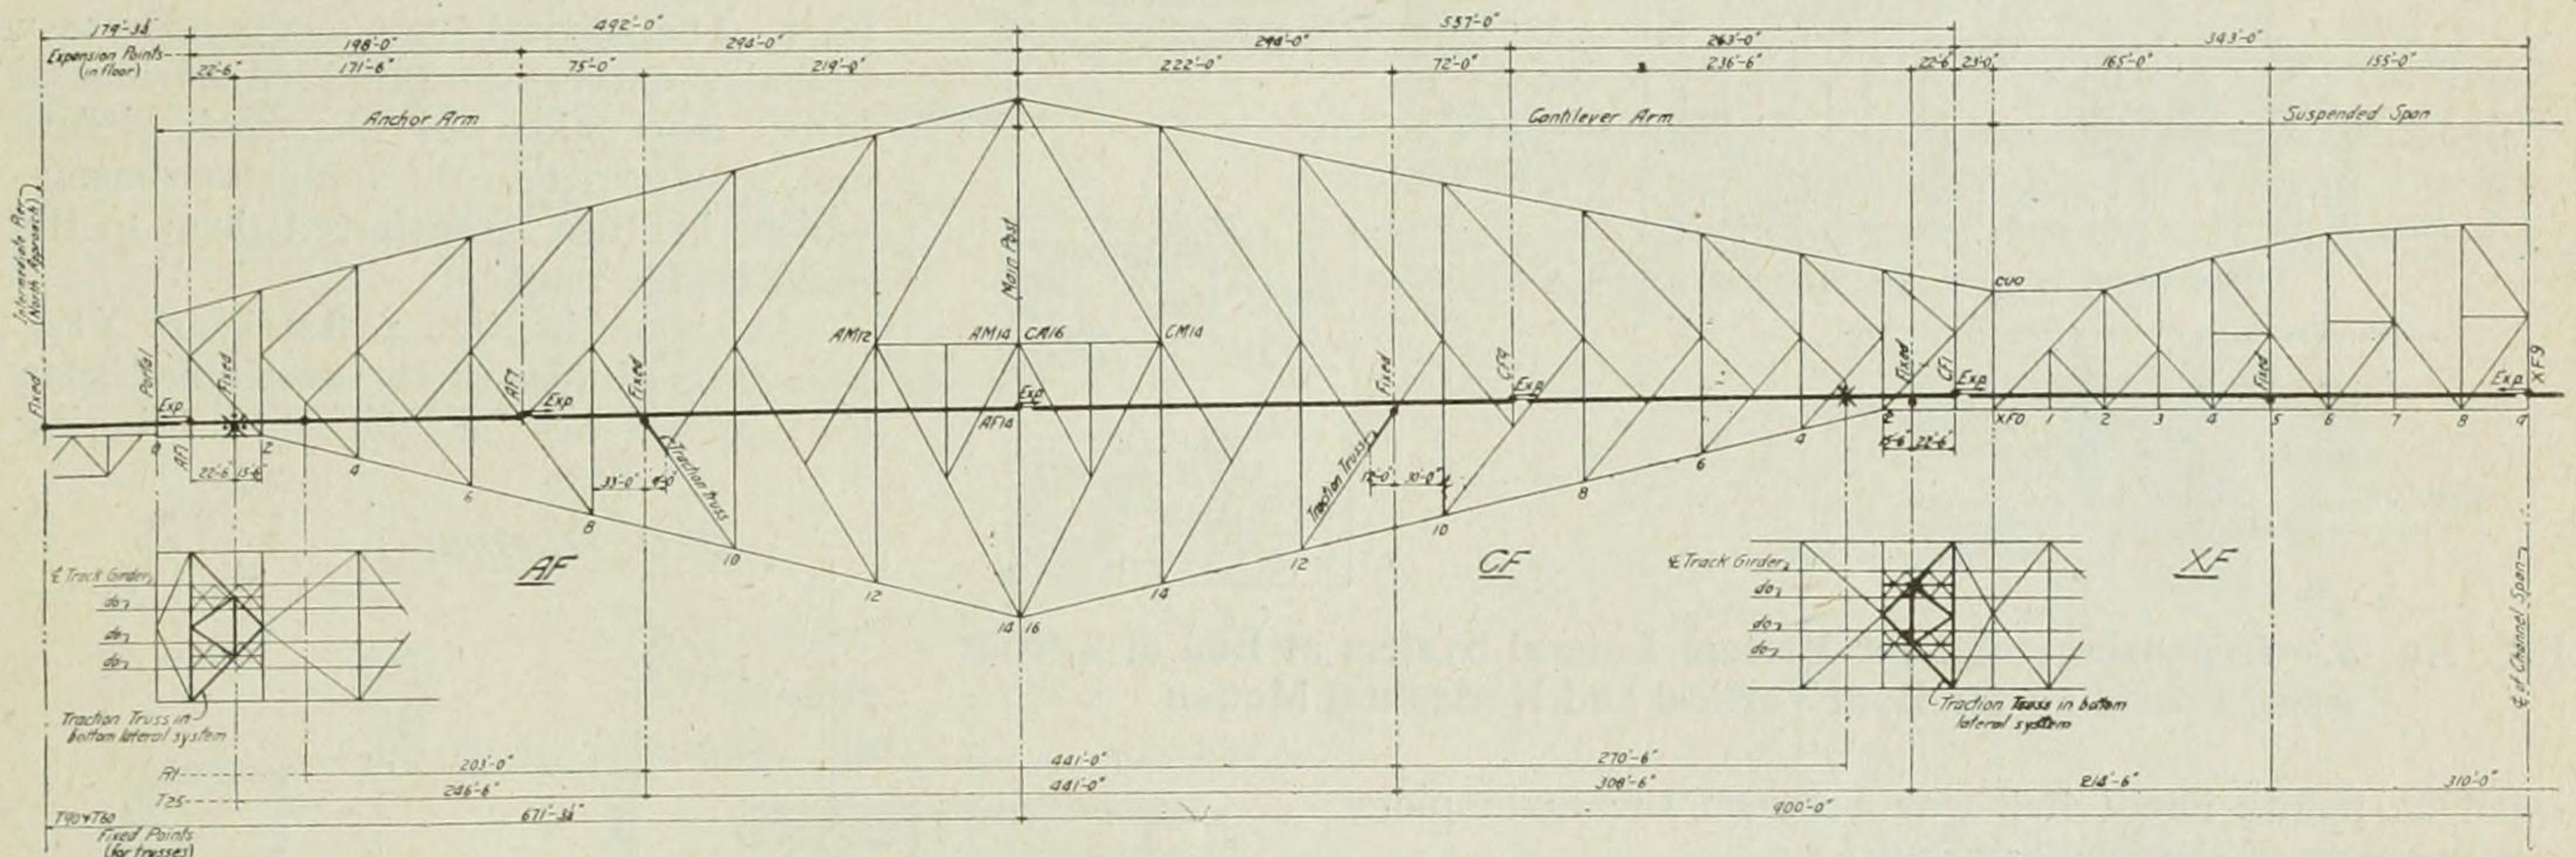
Elevation of Quebec Bridge Showing Location of Expansion Joints and Traction Trusses for Floor and Truss Systems
